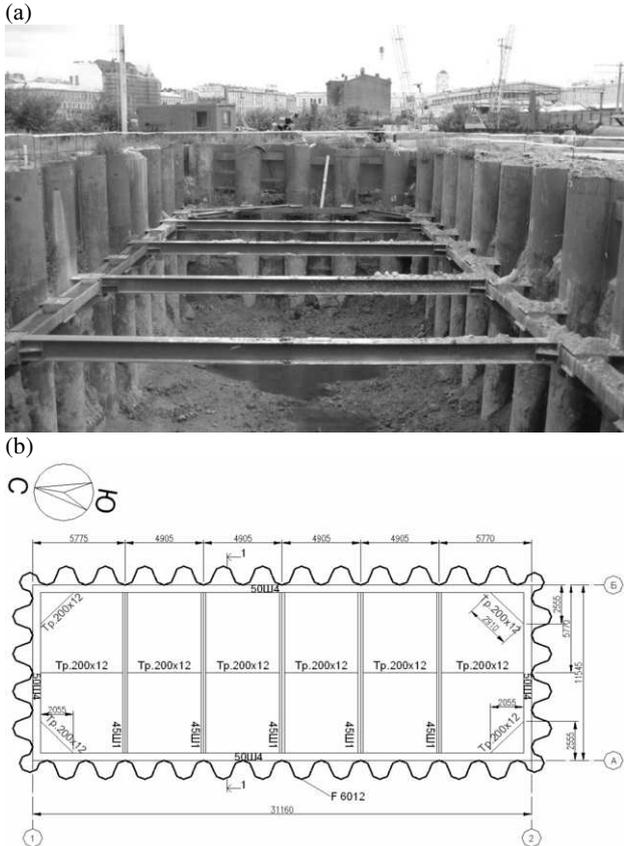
Overview (a) and (b) layout of sheet piles and beams at the level of -3.5 m from the sheet piles top at the test pit.
